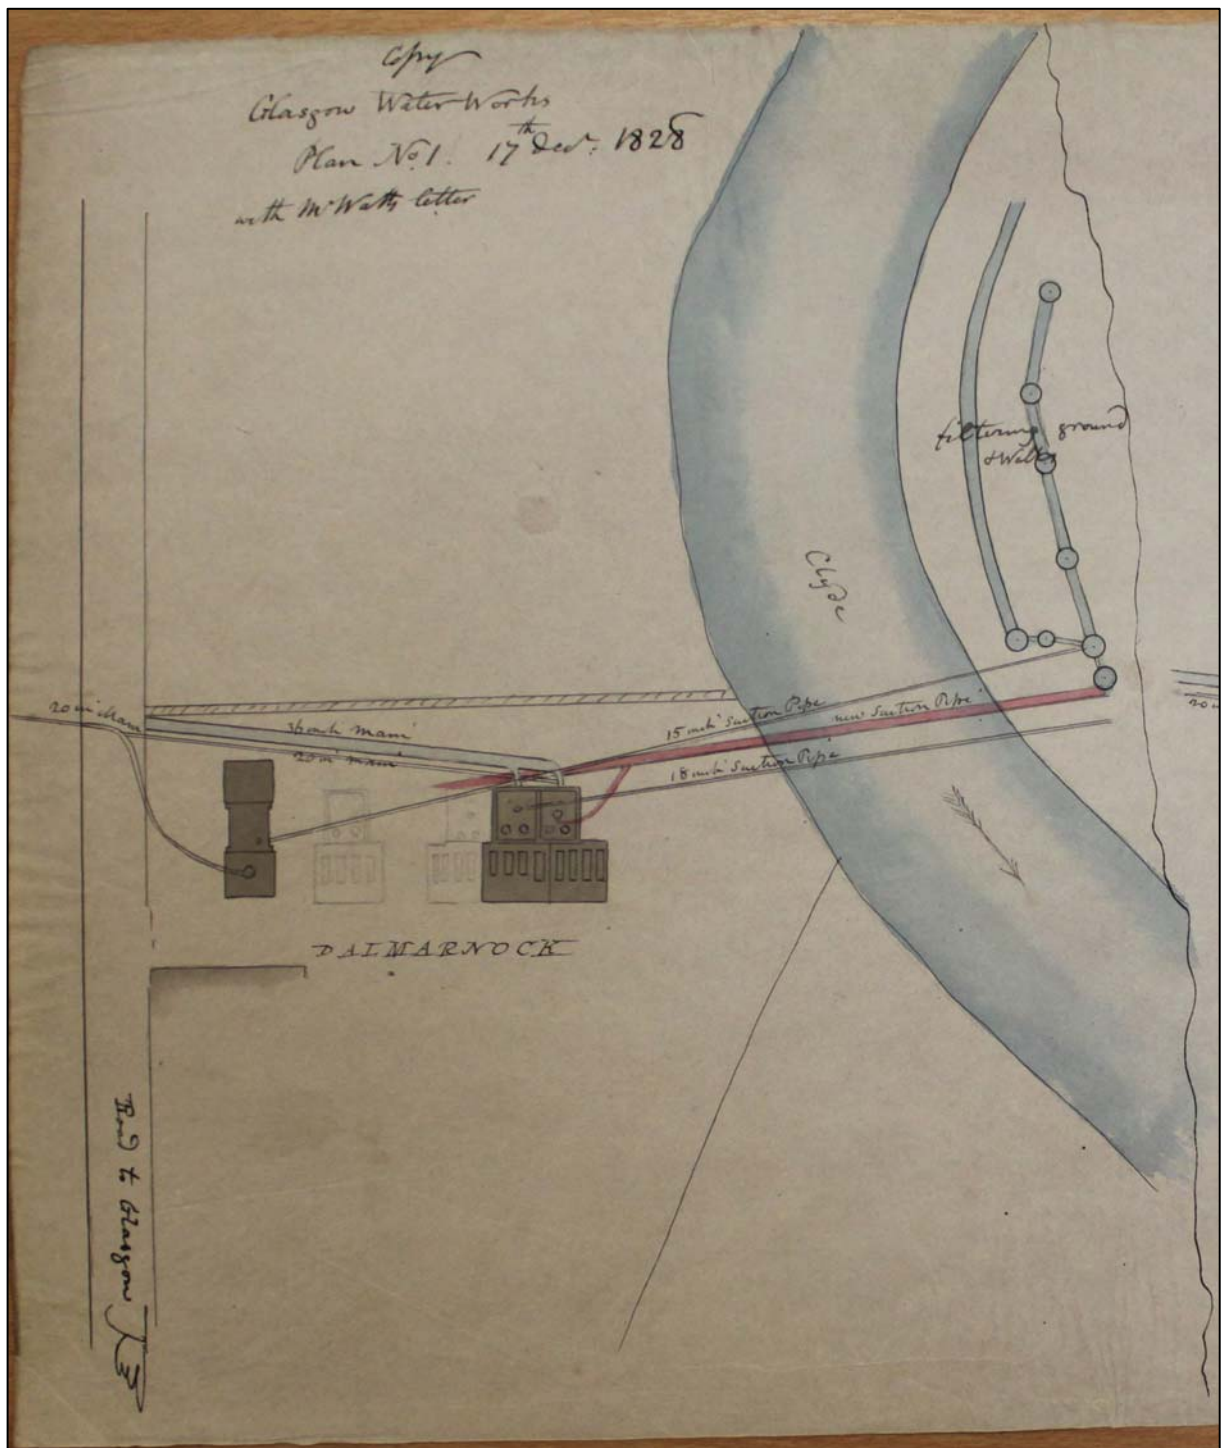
Plan of Dalmarnock Engine Houses, Pipes and Wells 1828
